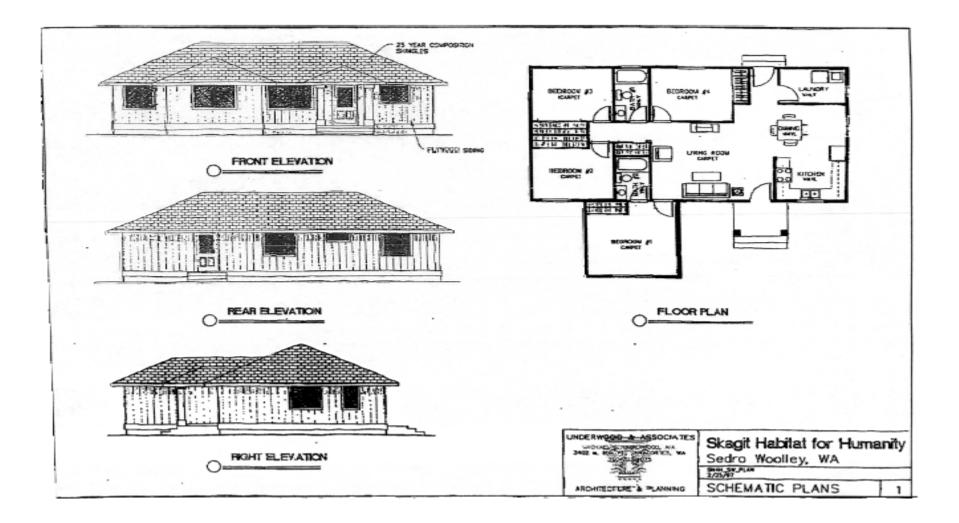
Sedro-Woolley SIP Home: Elevations and Floor Plan
